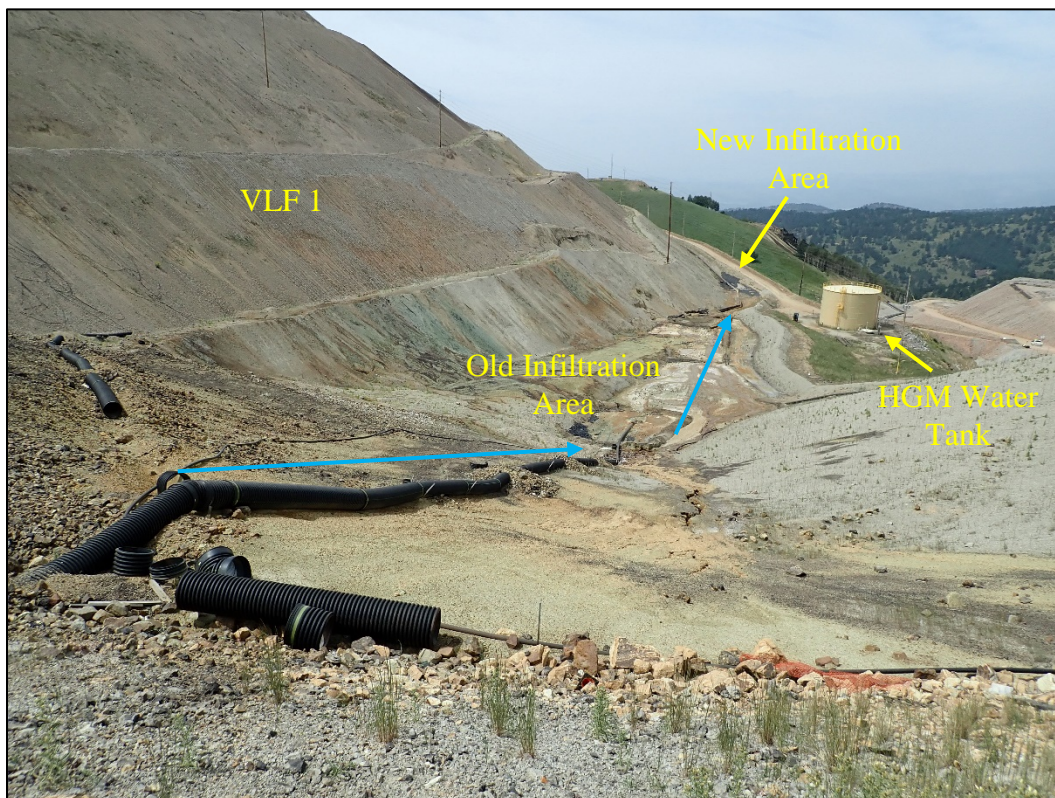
Path of stormwater in the area between HGM and VLF 1; looking west.
